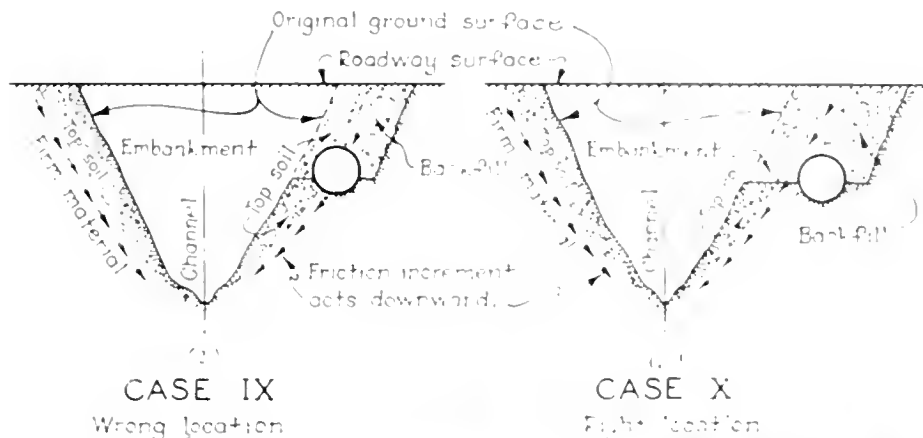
(i, j). Right and wrong way of installing culverts in sidehill location
